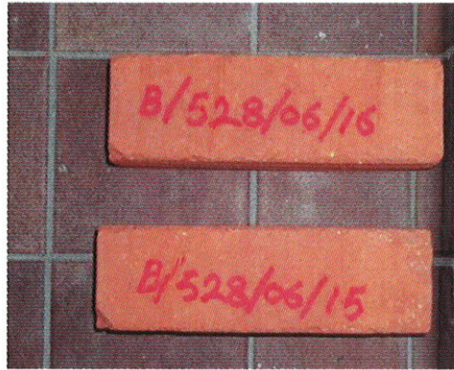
Orange fire bricks - Cremators Room and Storage Room
